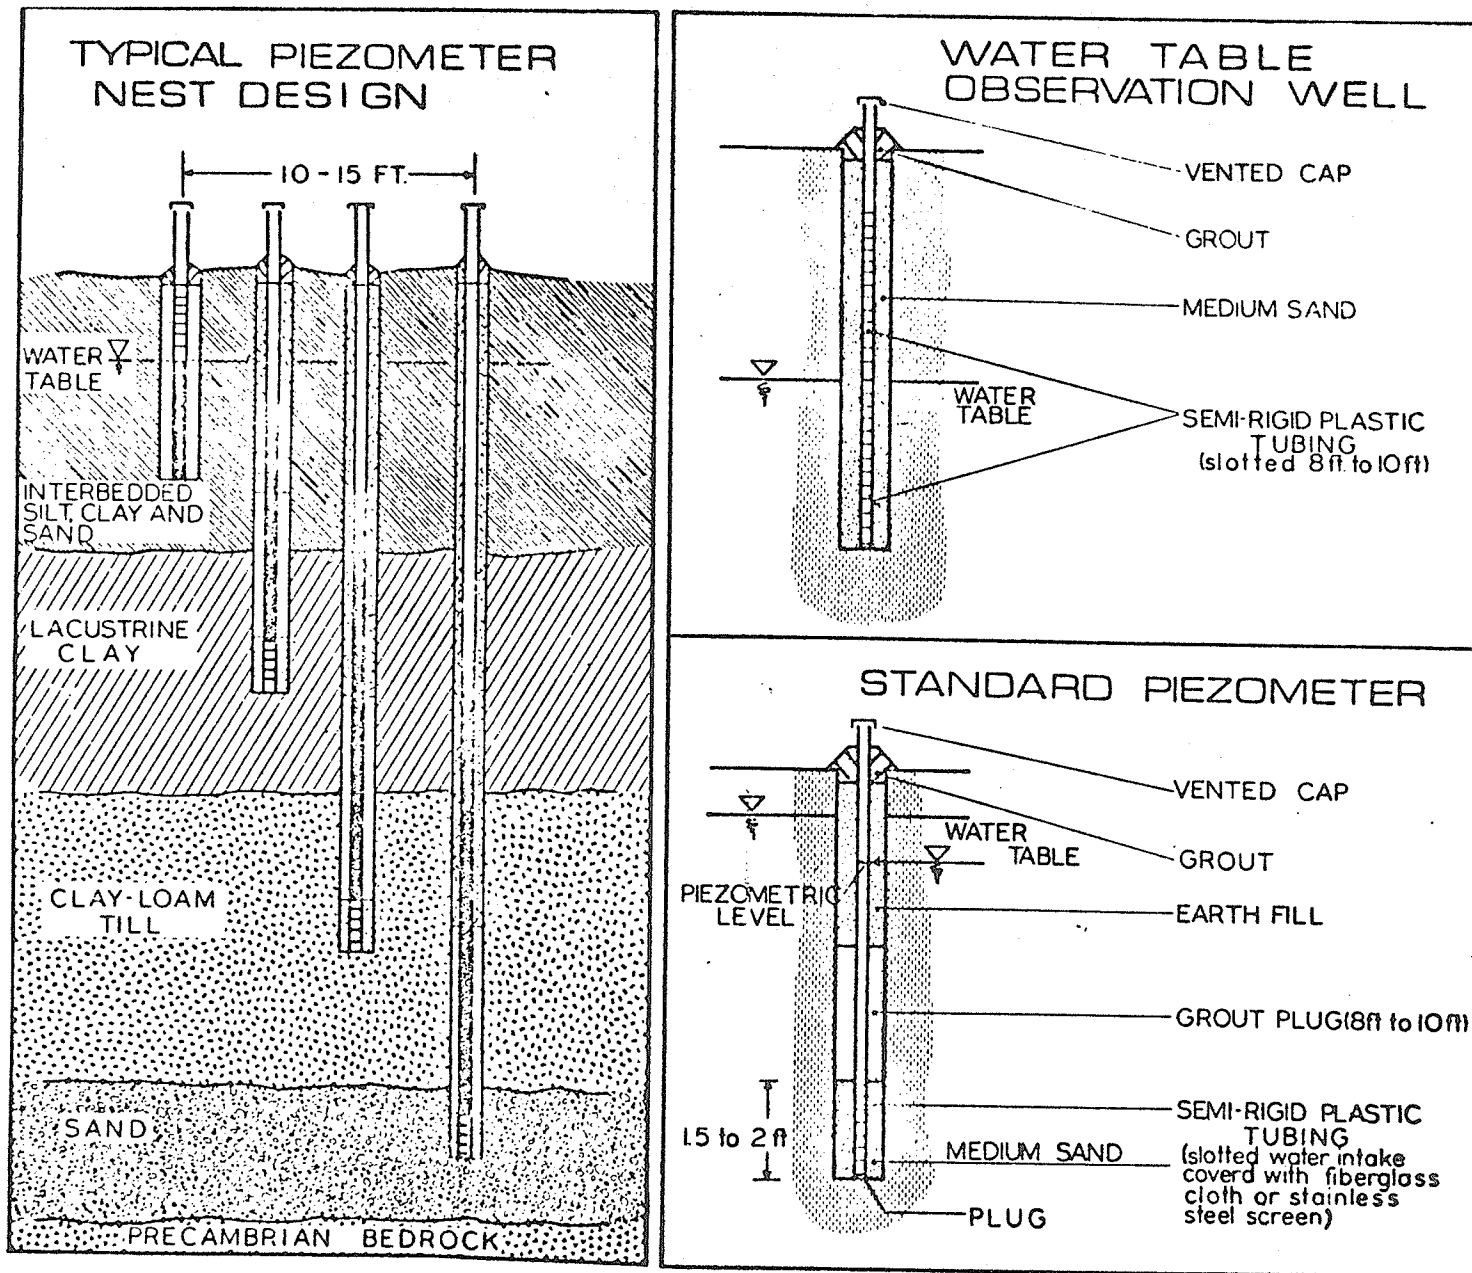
Construction details of plastic-walled piezometer and water-table installations (after Beswick, 1971).
